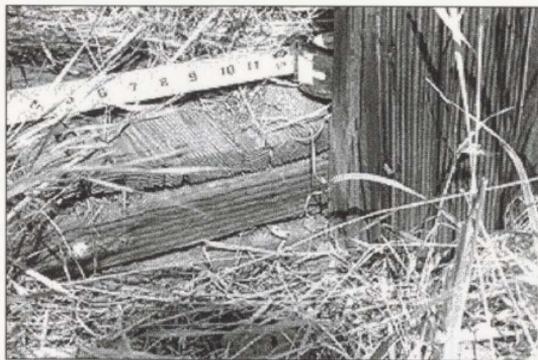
Storage Shed, Detail Showing the Floor Structure.
